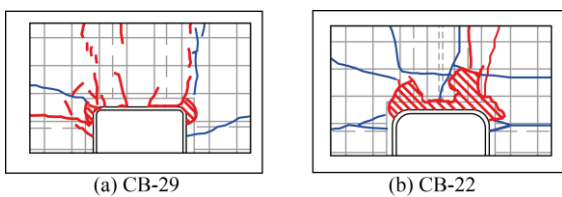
Final condition of concrete crush adjacent to the RHS column face
